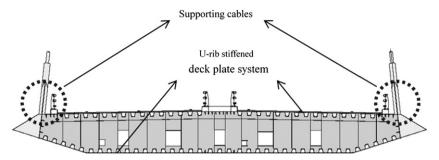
Typical cross section of stiffening box girder adopted in cable-supported bridges.
